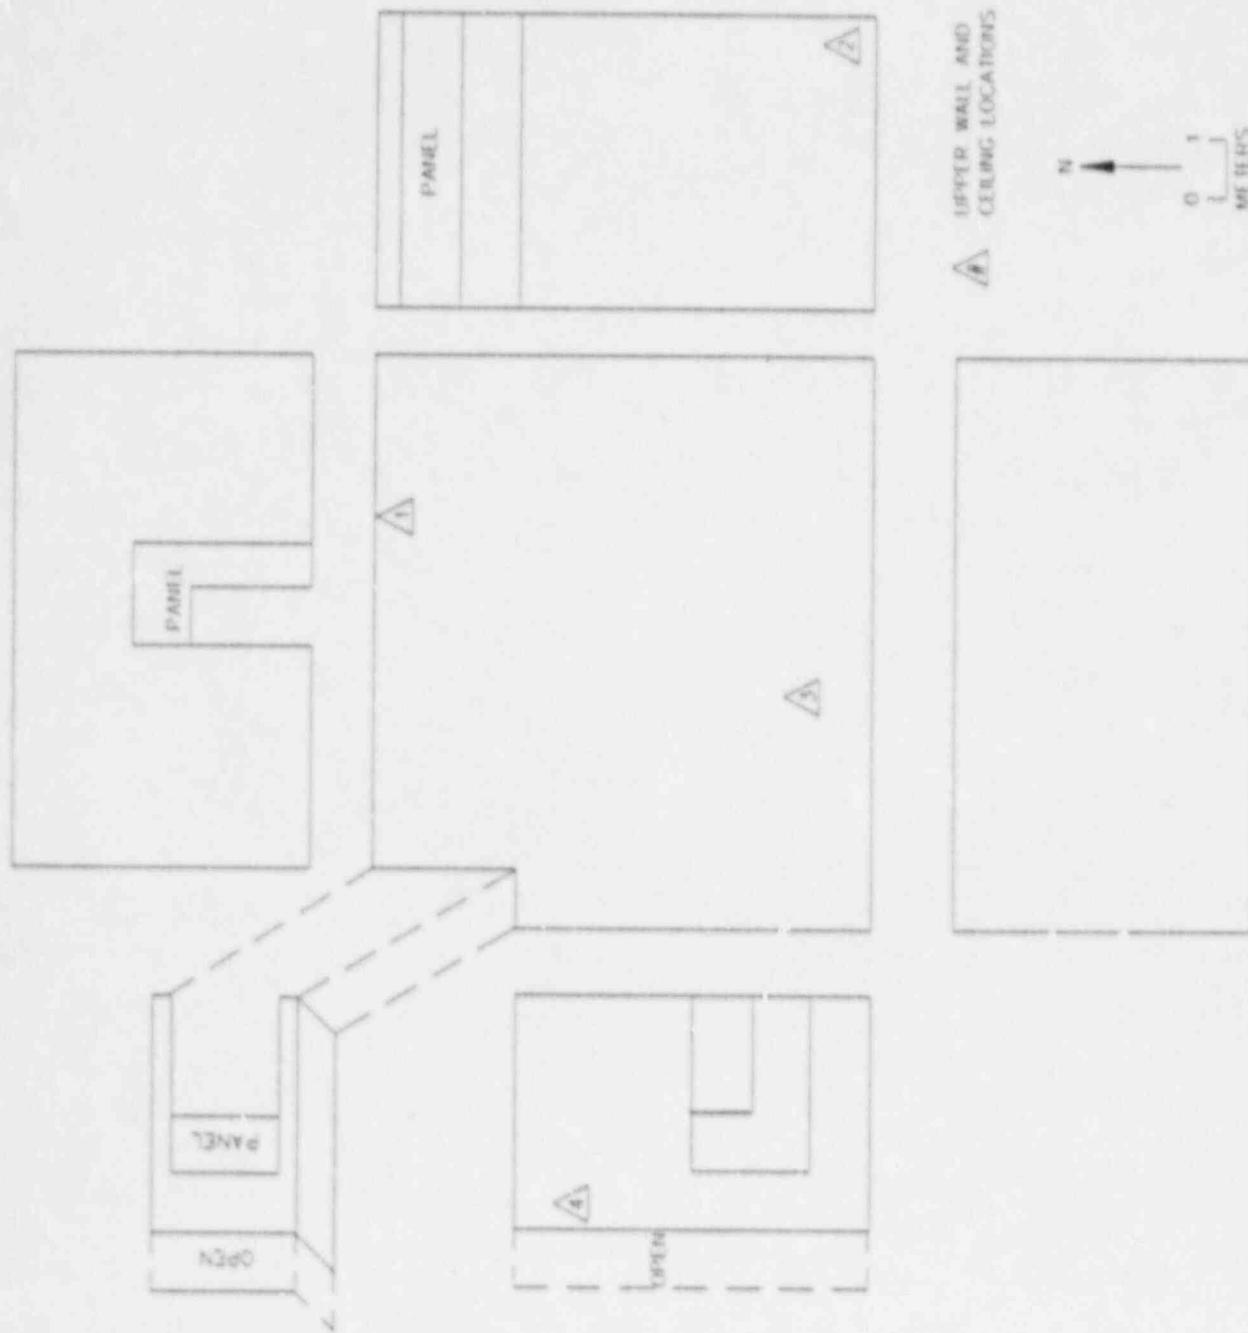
Room 15 Showing Locations of Upper Wall and Ceiling Single-point Measurements
